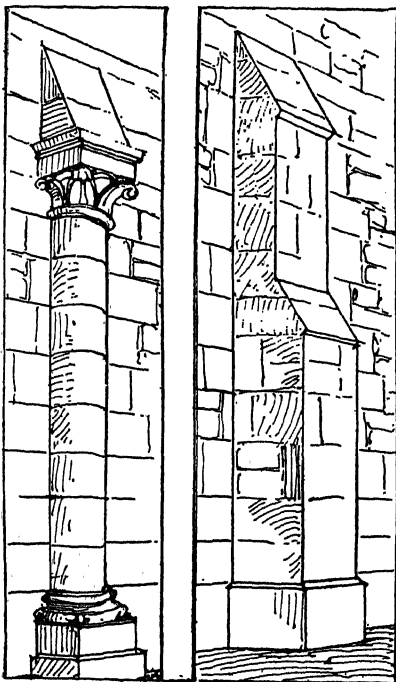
a. ROMANESQUE COLUMNAR WALL BUTTRESS. b. TYPICAL GOTHIC WALL BUTTRESS.
